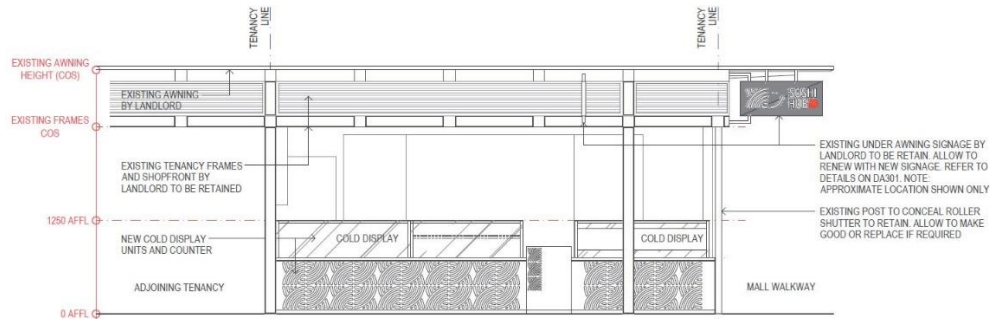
Shopfront elevation 1. (Source: Avance Design 2022).
